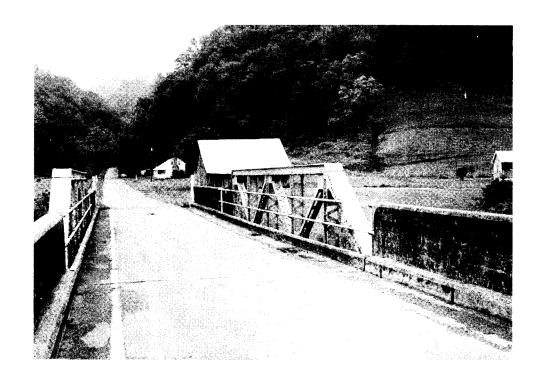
Pony truss span combined with two concrete spans in Scott County, over the Clinch River.
